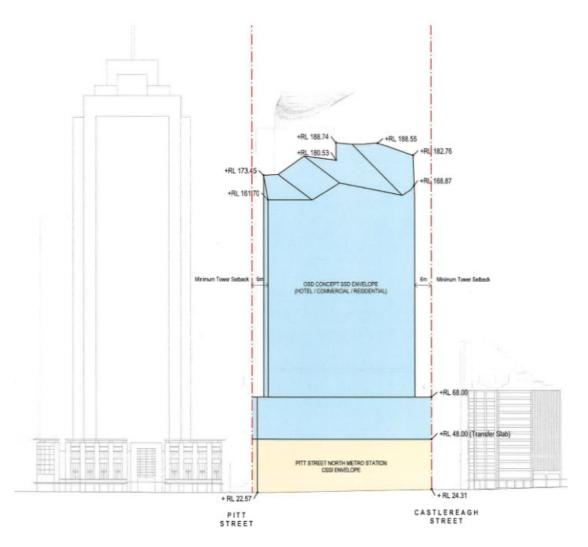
Pitt Street North Concept SSD DA – Envelope – South Elevation
